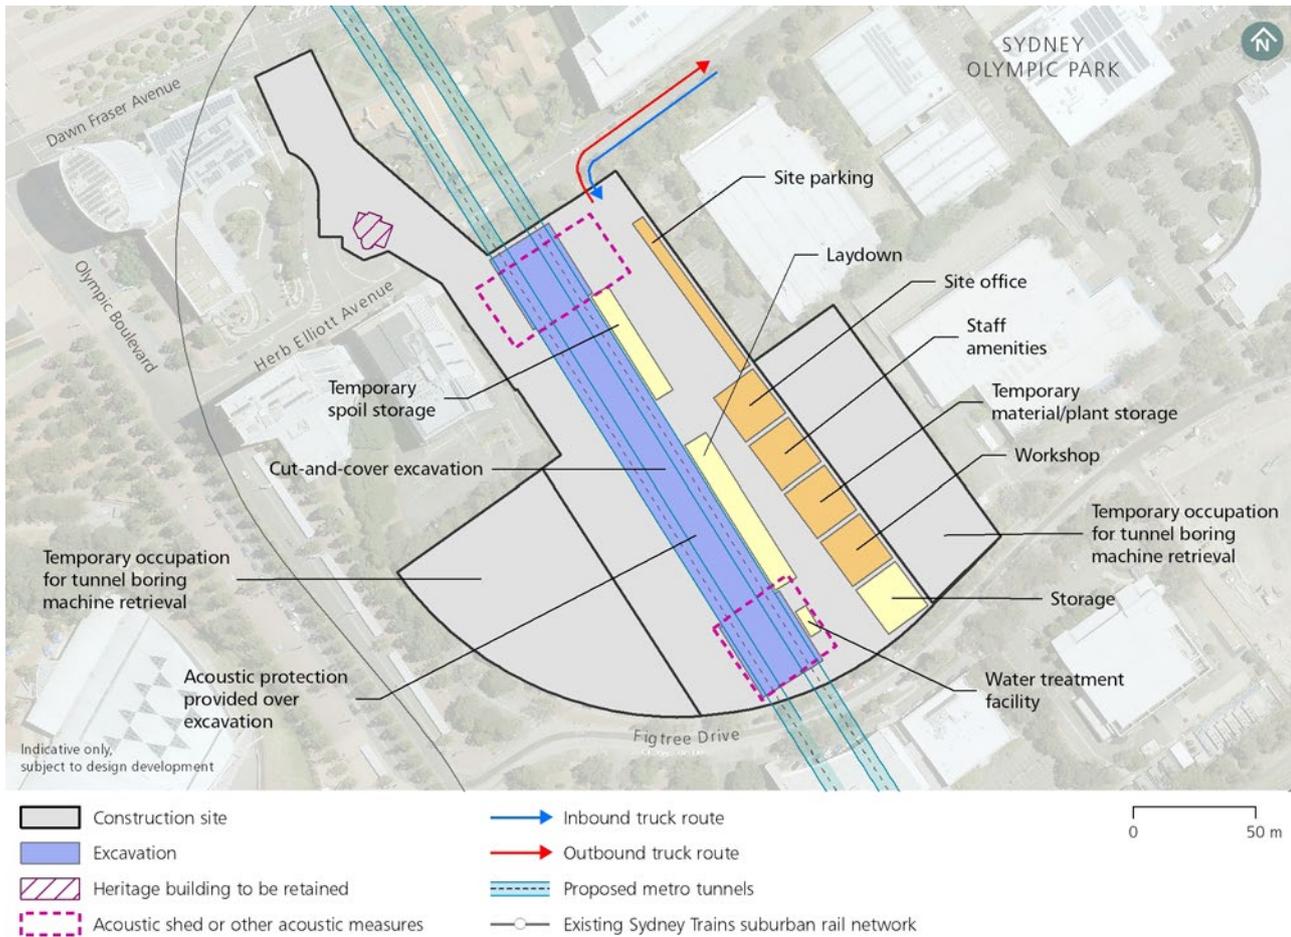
Exhibited Sydney Olympic Park metro station indicative construction site layout
